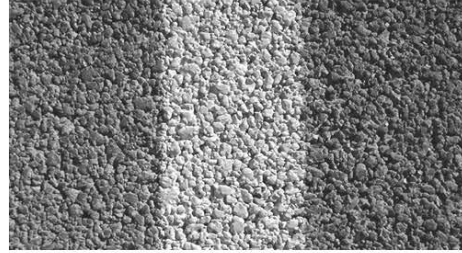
Painted lines visible on pervious concrete pavements.
